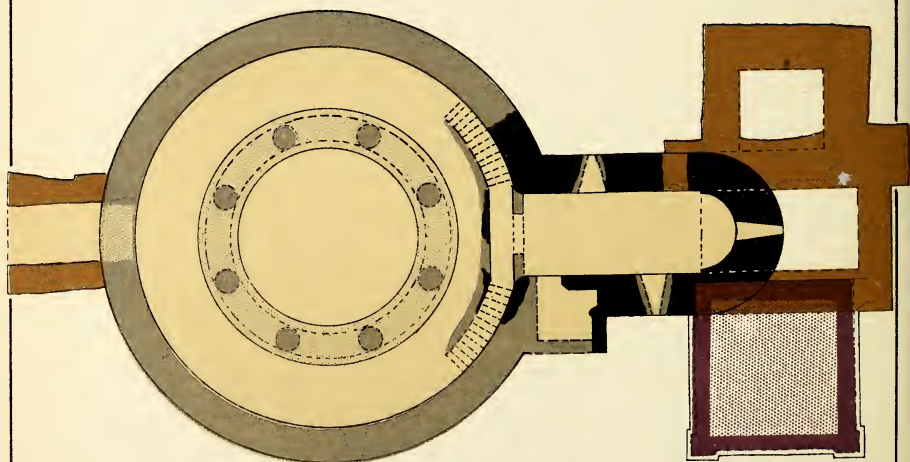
Plan as excavated of the crypt, etc., at Temple Bruer, Lincs.
